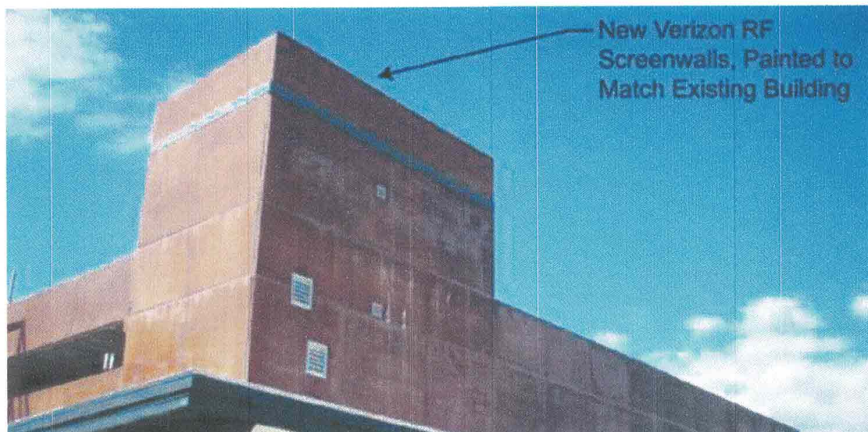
Photo simulation of Verizon's stealth wireless facility. AT&T is proposing to co-locate antennas behind this stealth screening.
